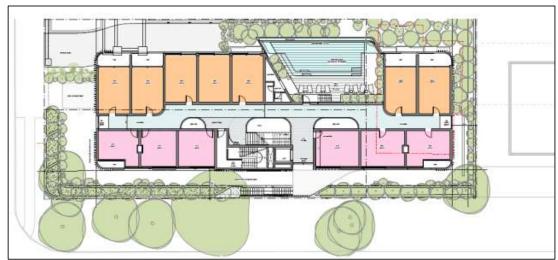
Excerpt from architectural plans; Indicative level 01 and 02 floor plan.
